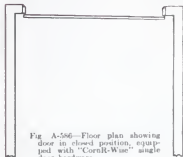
Floor plan showing door in closed position, equipped with "Corn-R-Wise" single door hardware.
